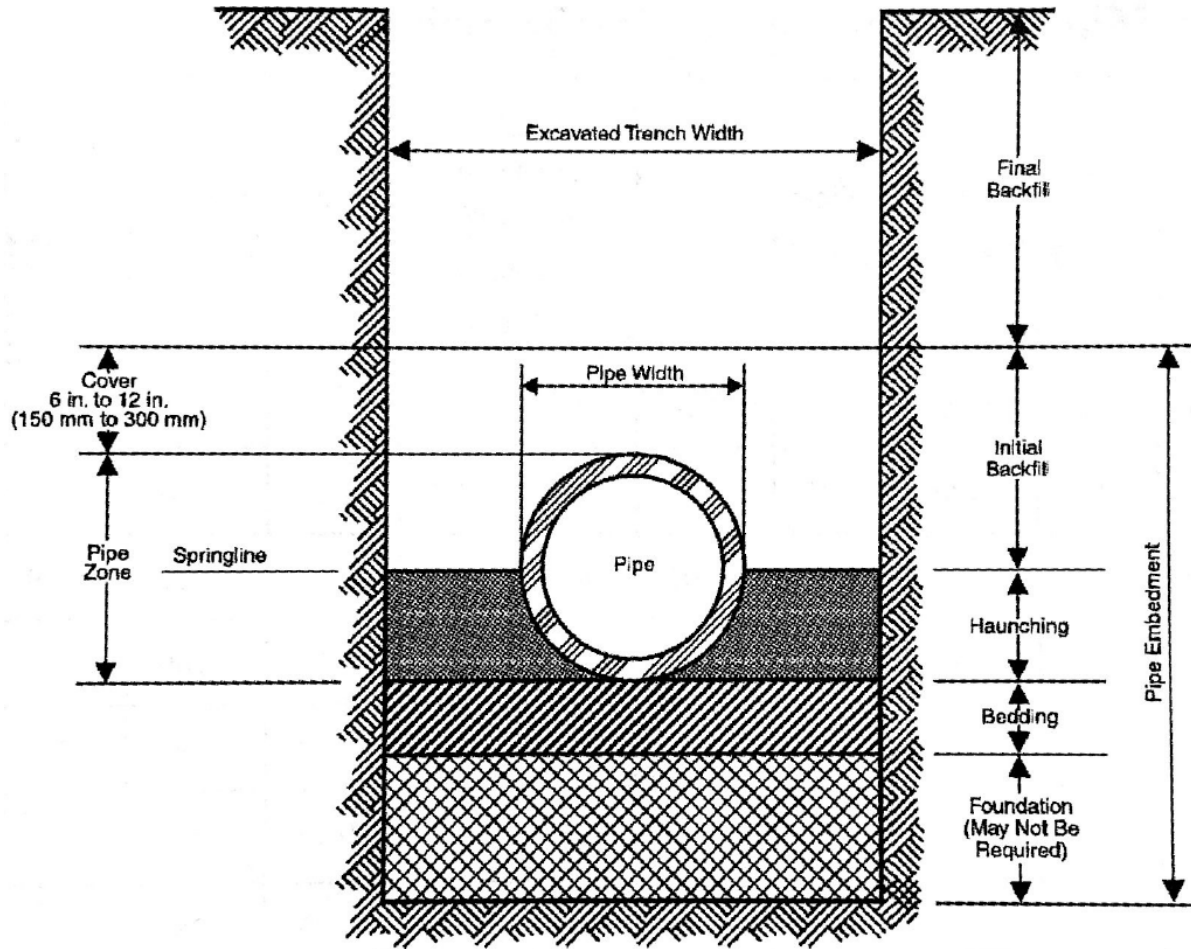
Typical burial configuration of a pipe in trench (Moser and Folkman 2008).
